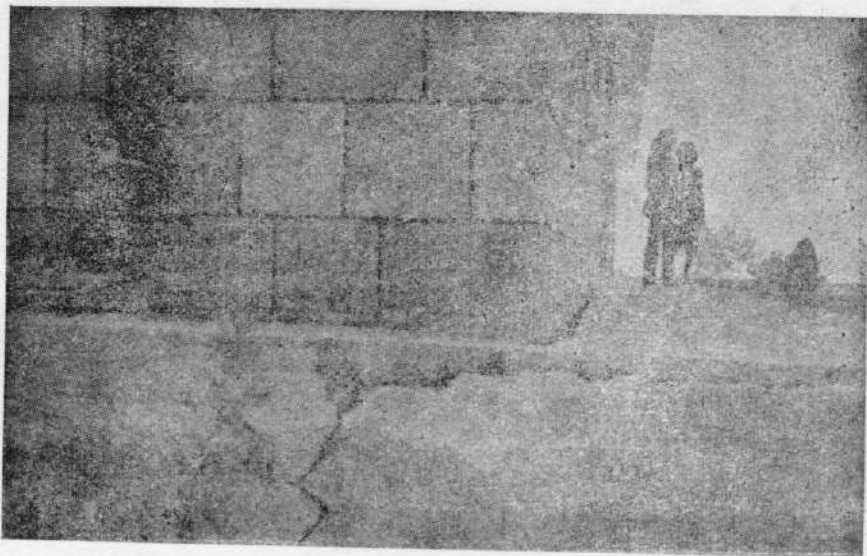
Cracks and separation on the North-East corner of the foundation and wall of the Dohran Dispensary. Sinking of outside passage.
